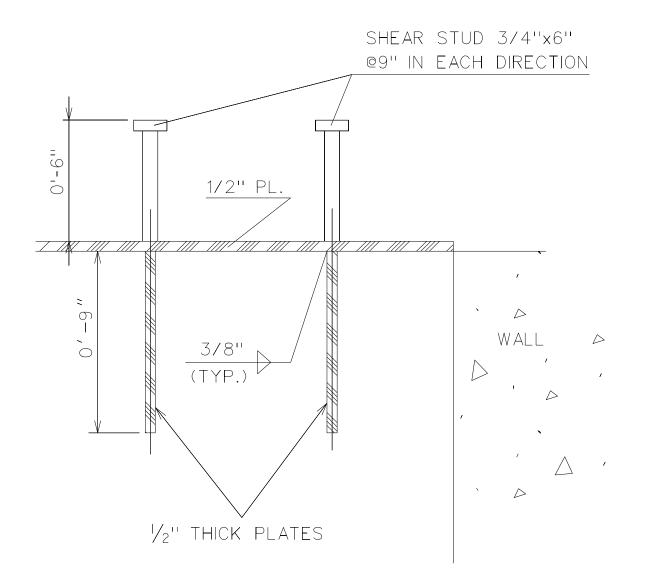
H.5-9 (Sheet 3 of 3) [Auxiliary Building Finned Floor]
